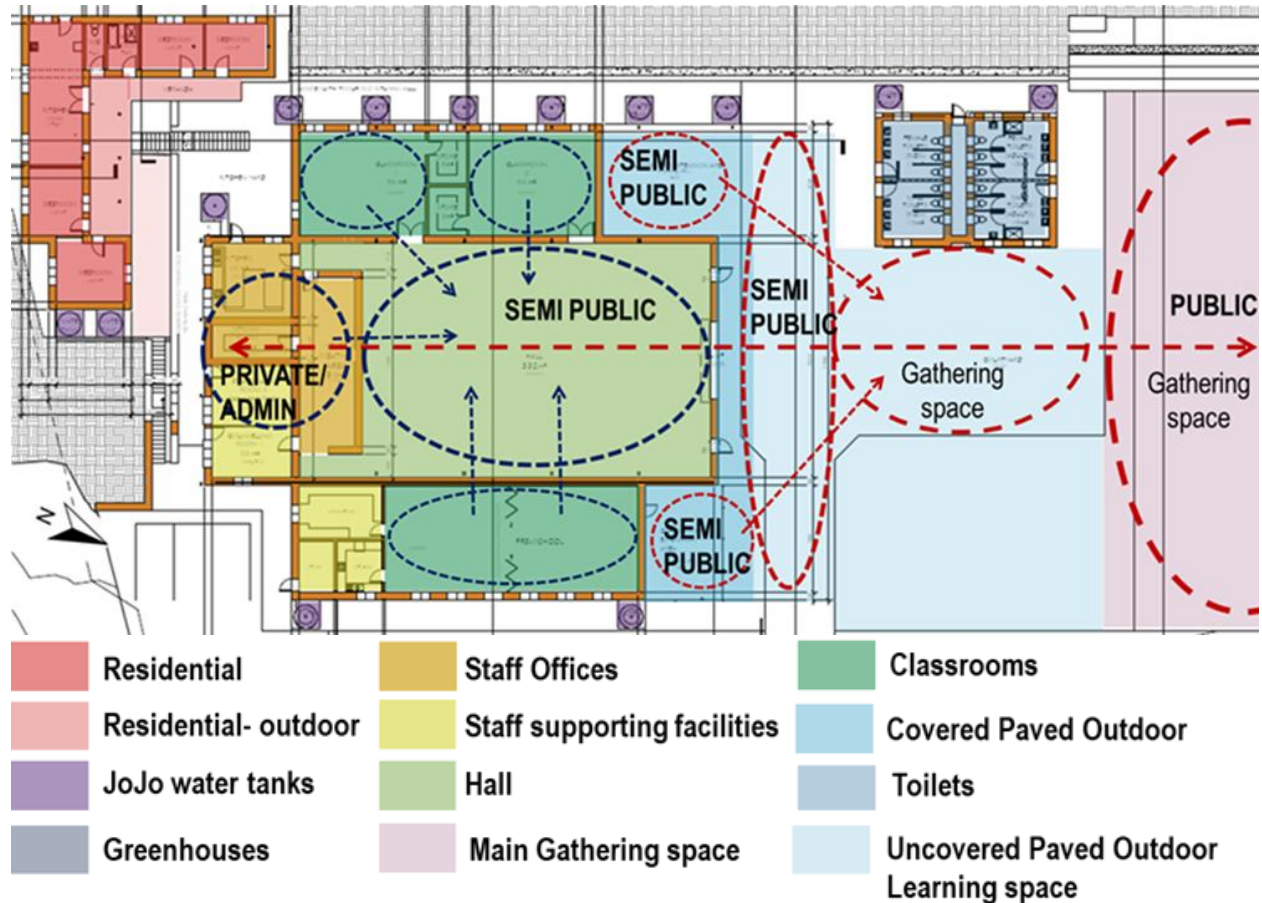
illustrates IthembalamaMpumuza ECD Floor plan. *Source:* (Modified by Author from Brian Chonco Architects).
